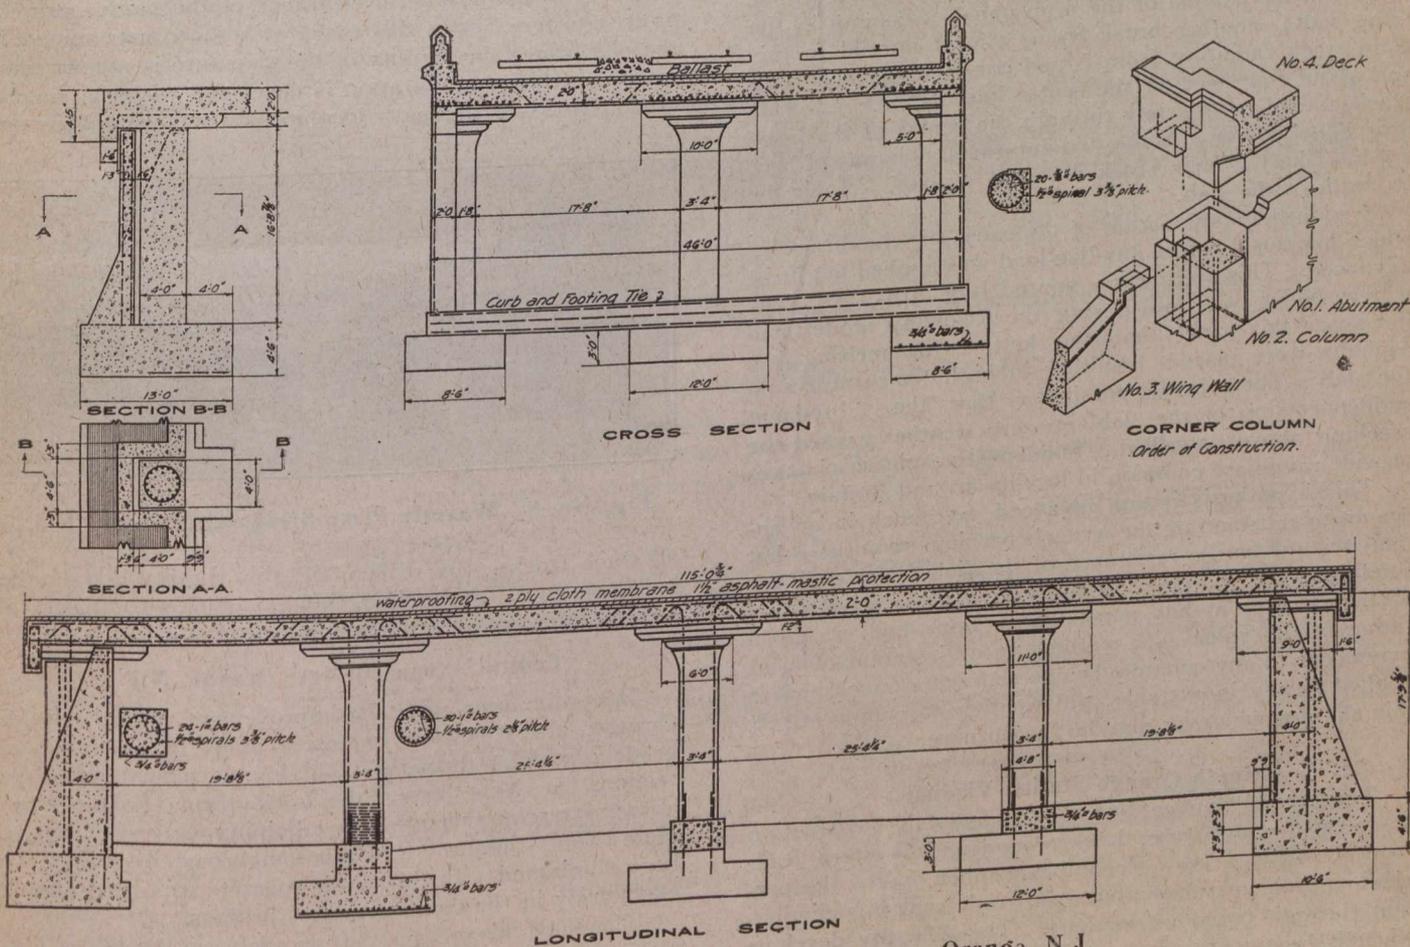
Details of Bridge at Central Avenue, Orange, N.J.
